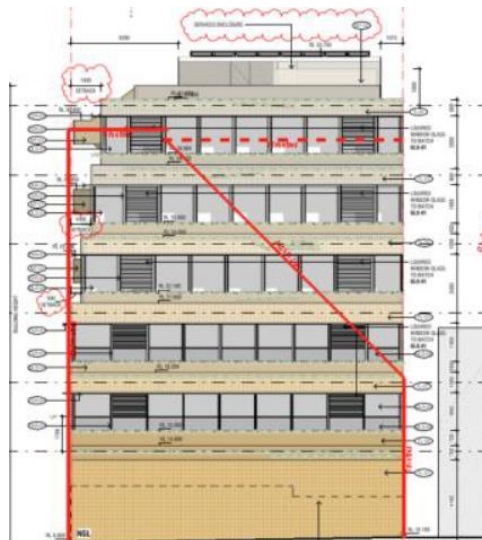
Proposed east elevation with Draft UDF preferred upper-level setback envelope outlined in red
